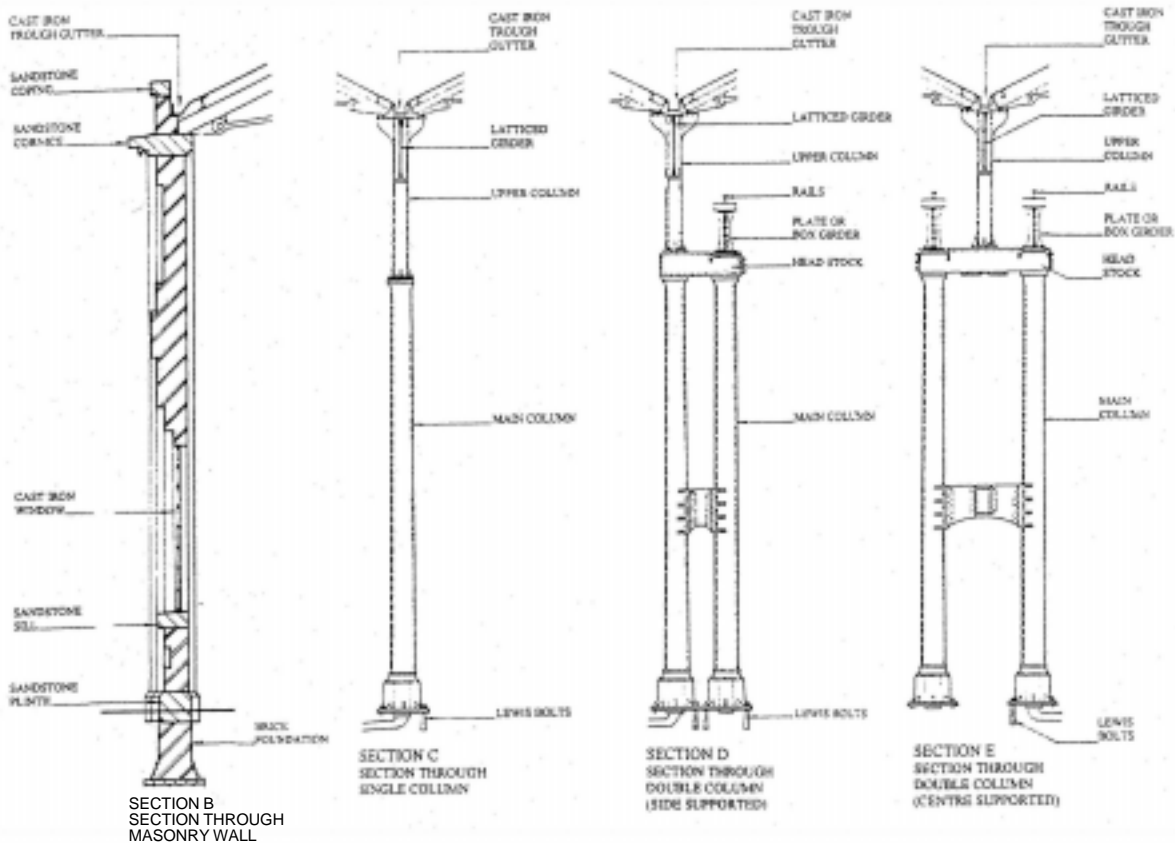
Cross sections of the various column and wall arrangements. Source: OC+P
